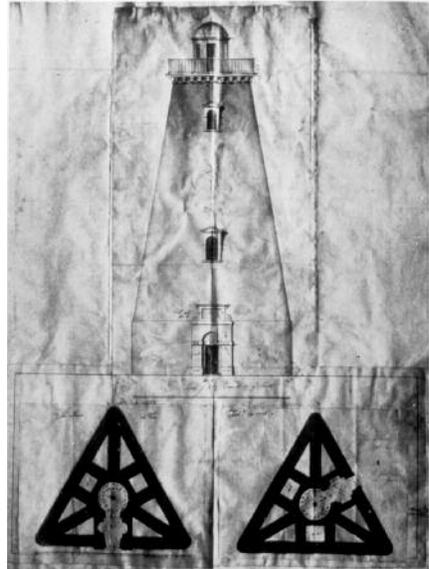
Henry Flitcroft, elevation and plans of Hooper Stand, Wentworth, Yorkshire (West Riding), c.1747.
